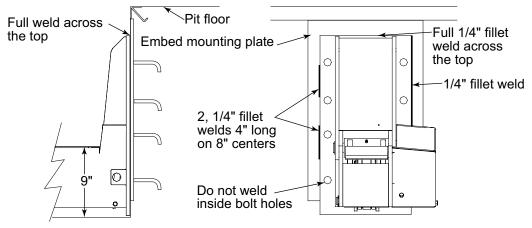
WELD TO EMBED MOUNTING PLATE (Optional, applies to 2" stand-off bracket weld on)
